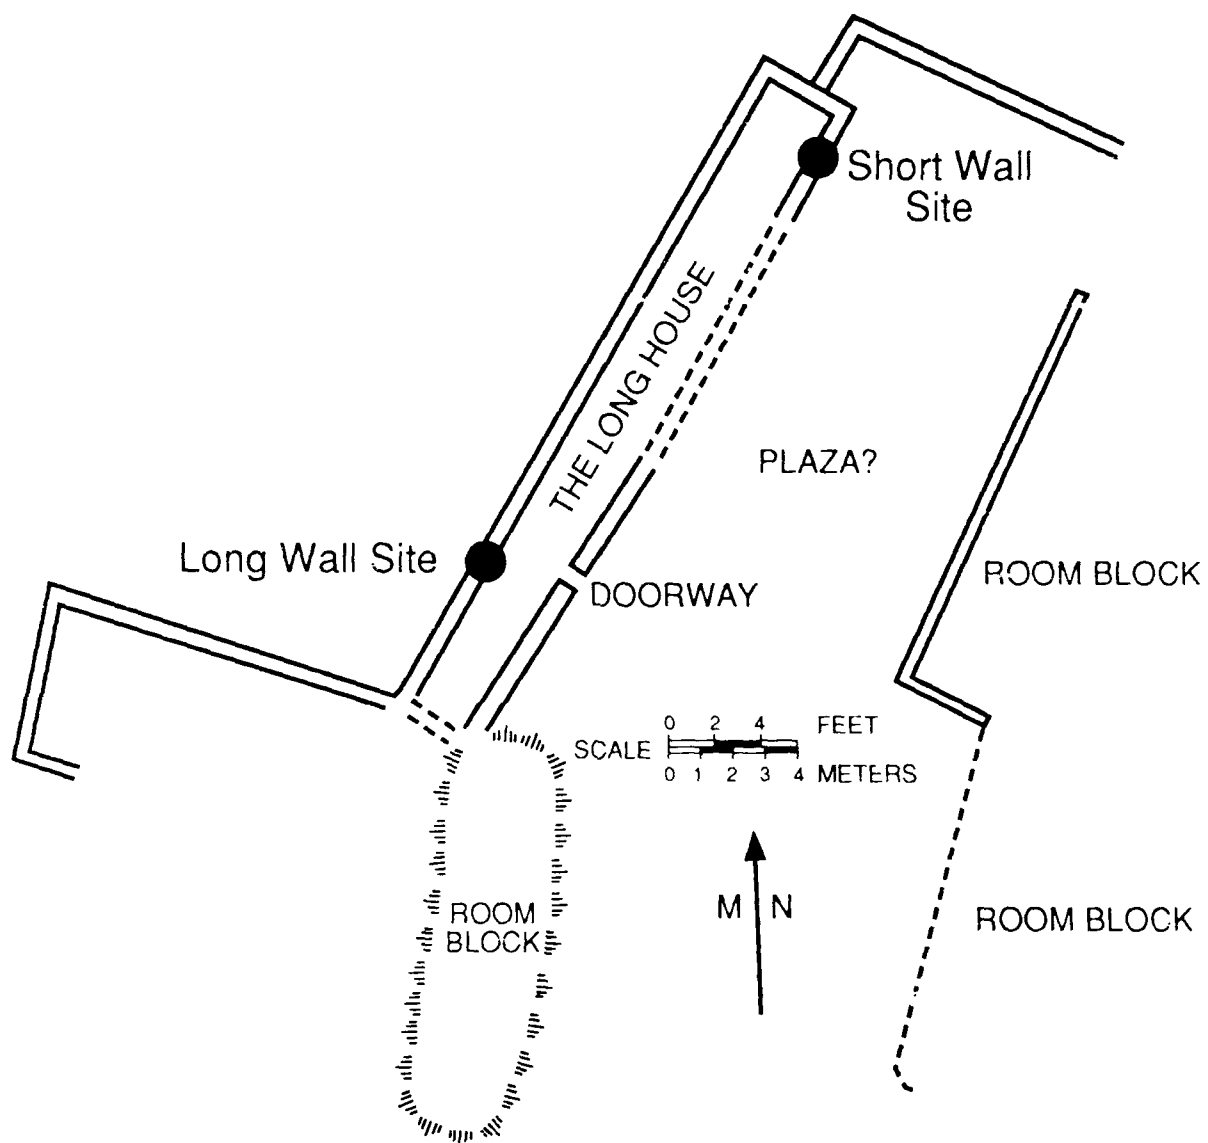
Plan View of Long House Ruins Showing the Instrument Locations
